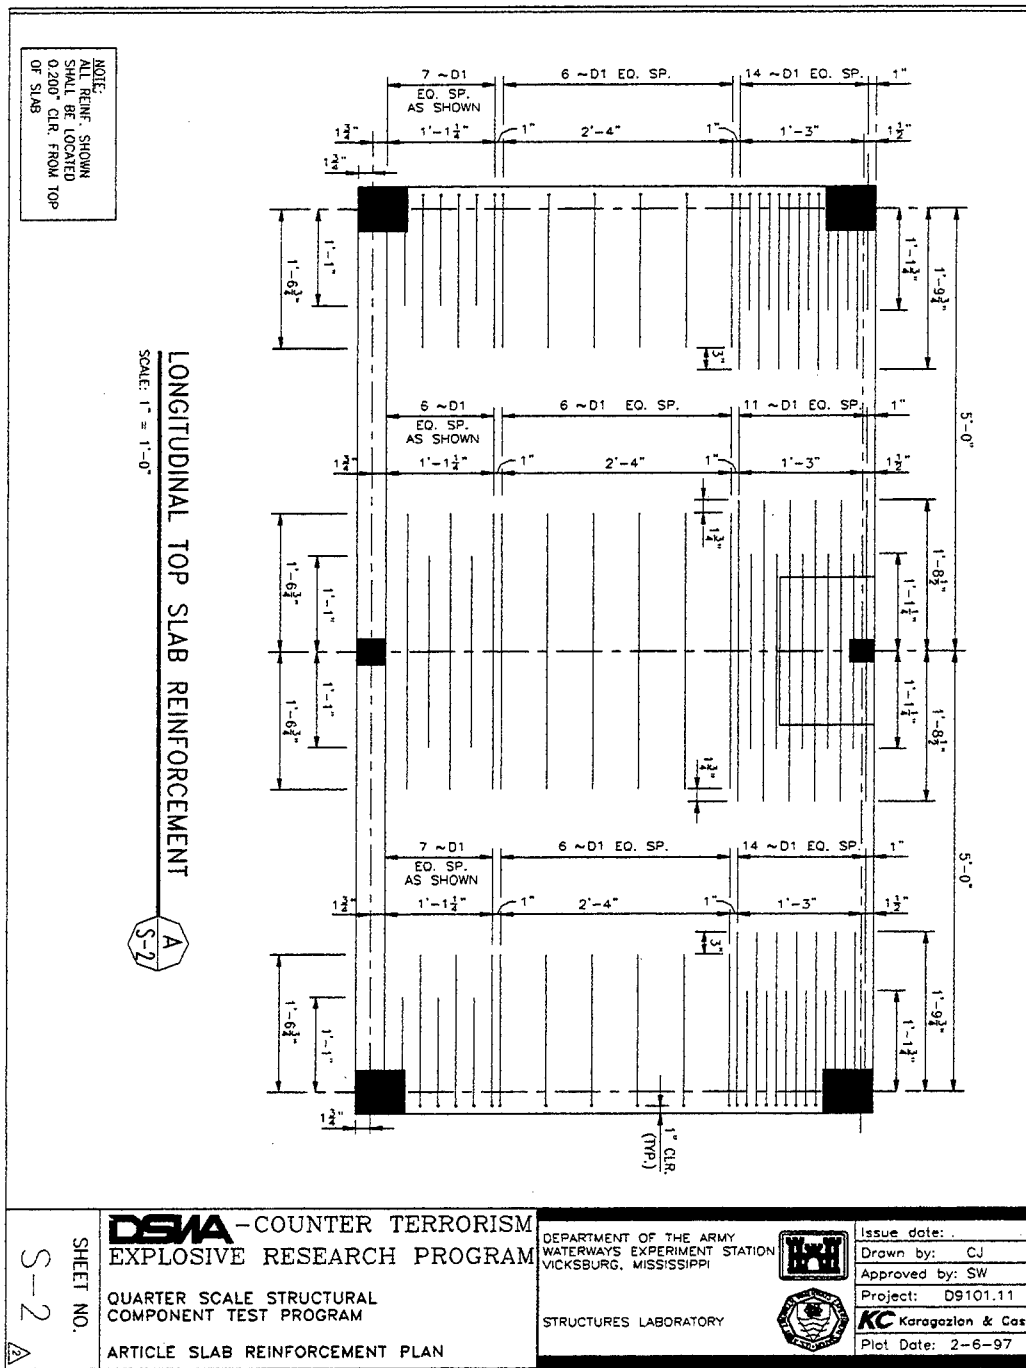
Slab Reinforcement Details, Top Longitudinal
